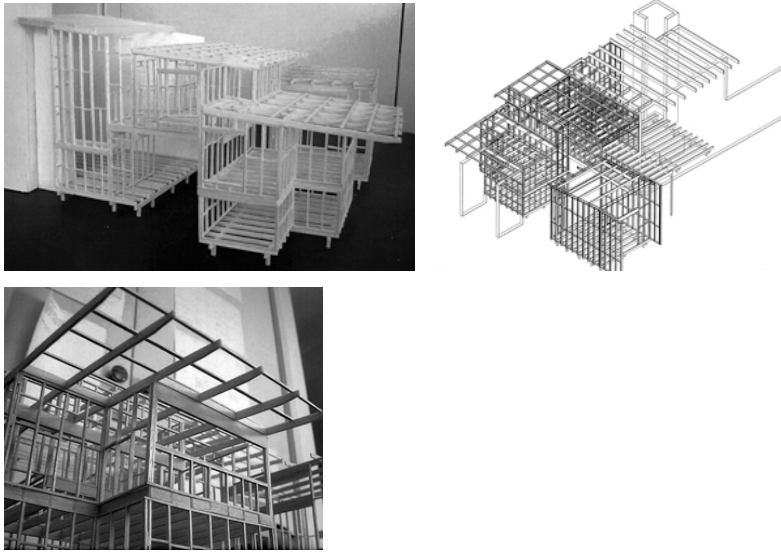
Joshua Spillane, Timber Construction Technology 1, ARCH1220, UQ 2004.
